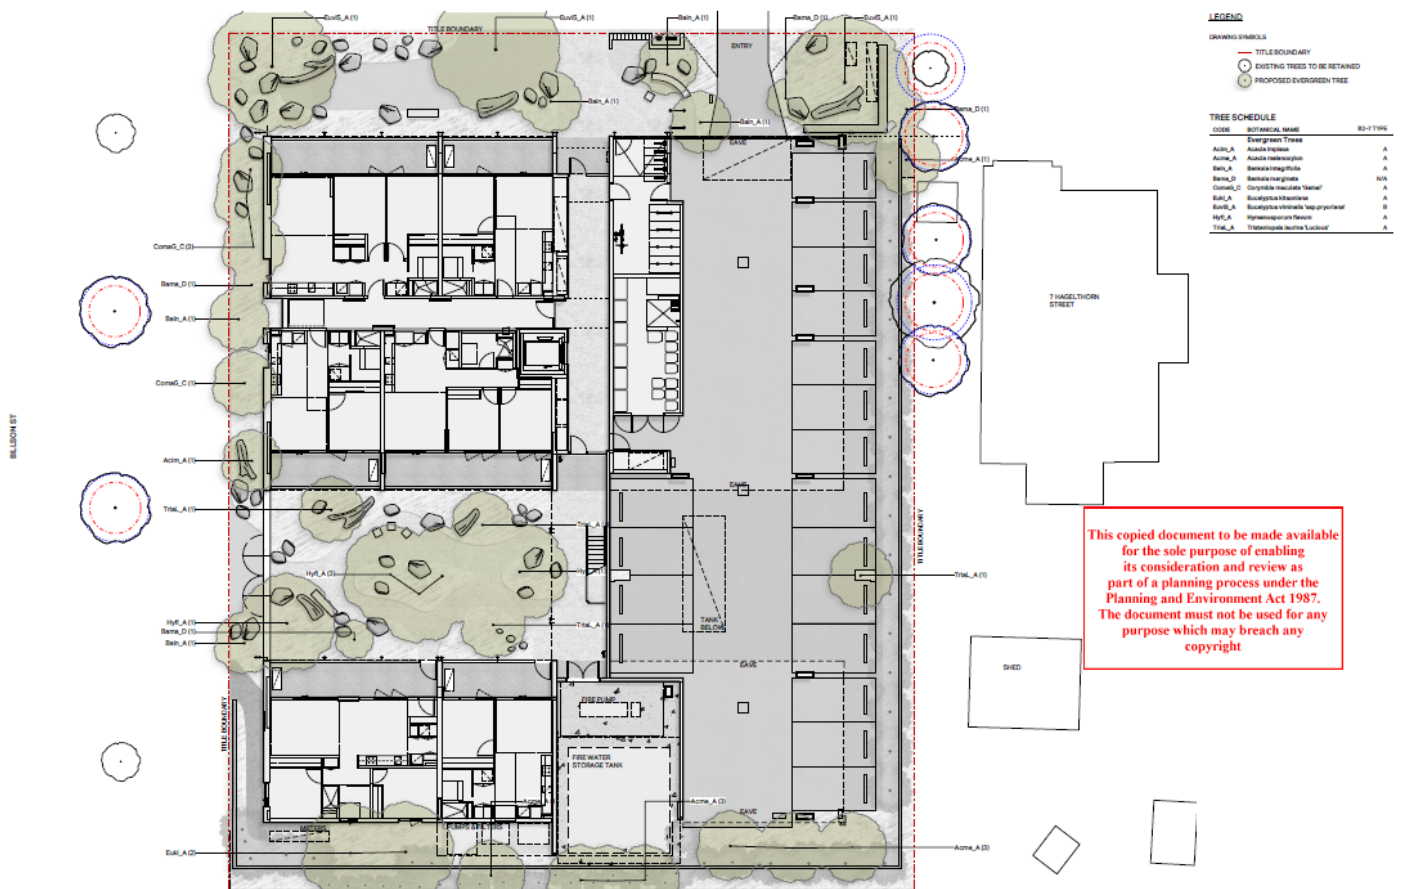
Extract from the landscape concept plan showing the proposed landscape features
